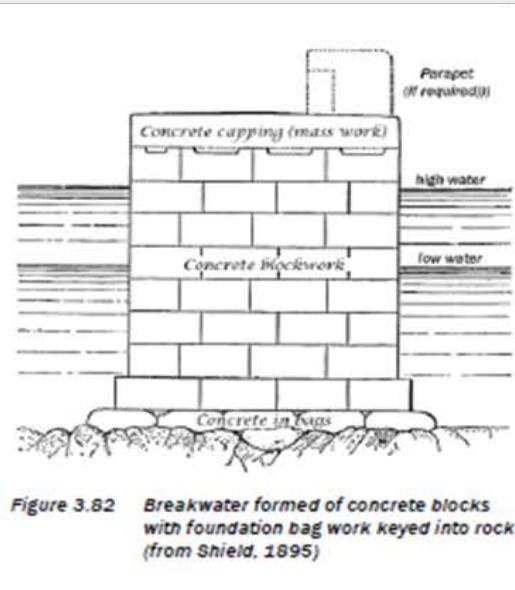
Breakwater formed of concrete blocks with foundation bag work keyed into rock (from Shield, 1895)
